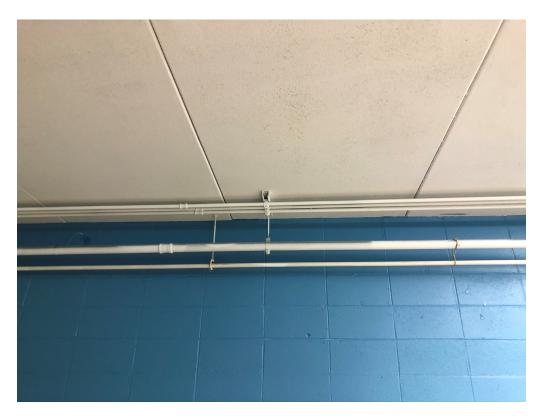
Ceiling paint Work; Pipes should be fully painted if attached to ceiling.
